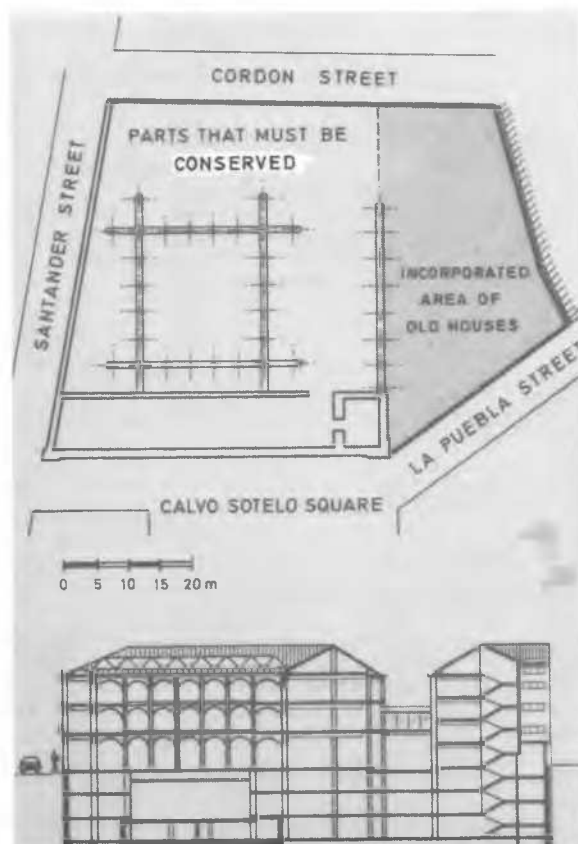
Plant of the "Casa del Cordón" and cross-section of the new Building.
